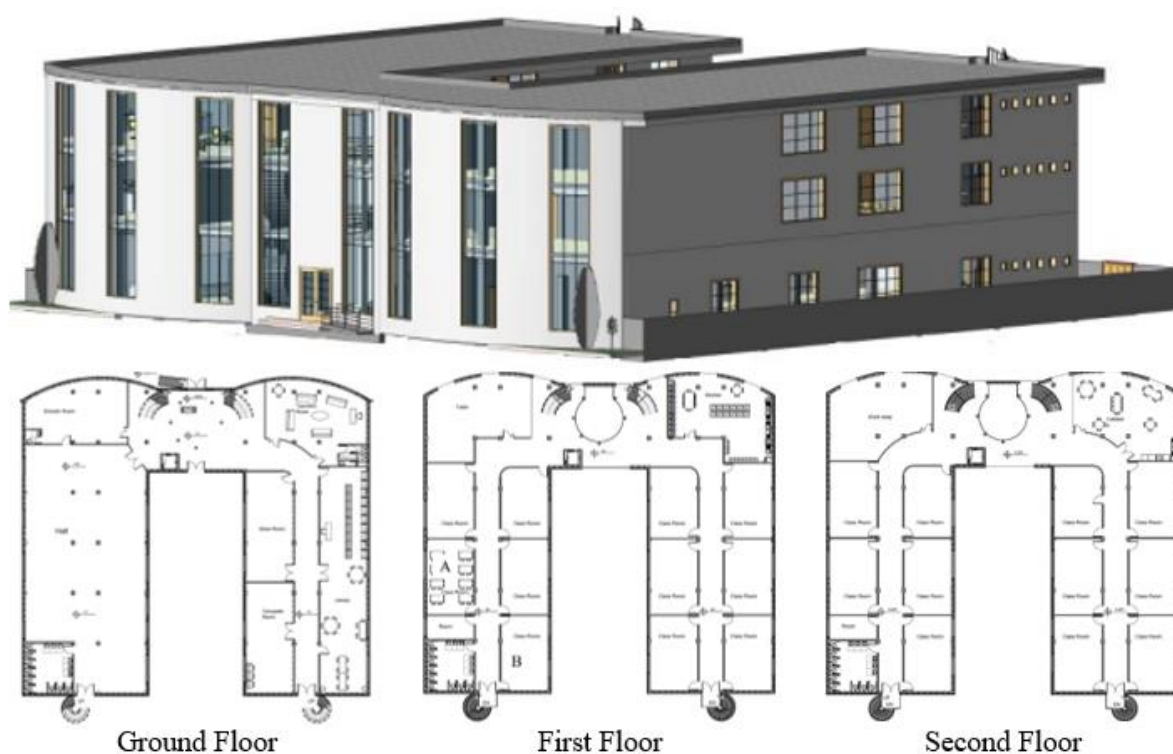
3D Model and the floor plans of the school building (Najib, 2019)
